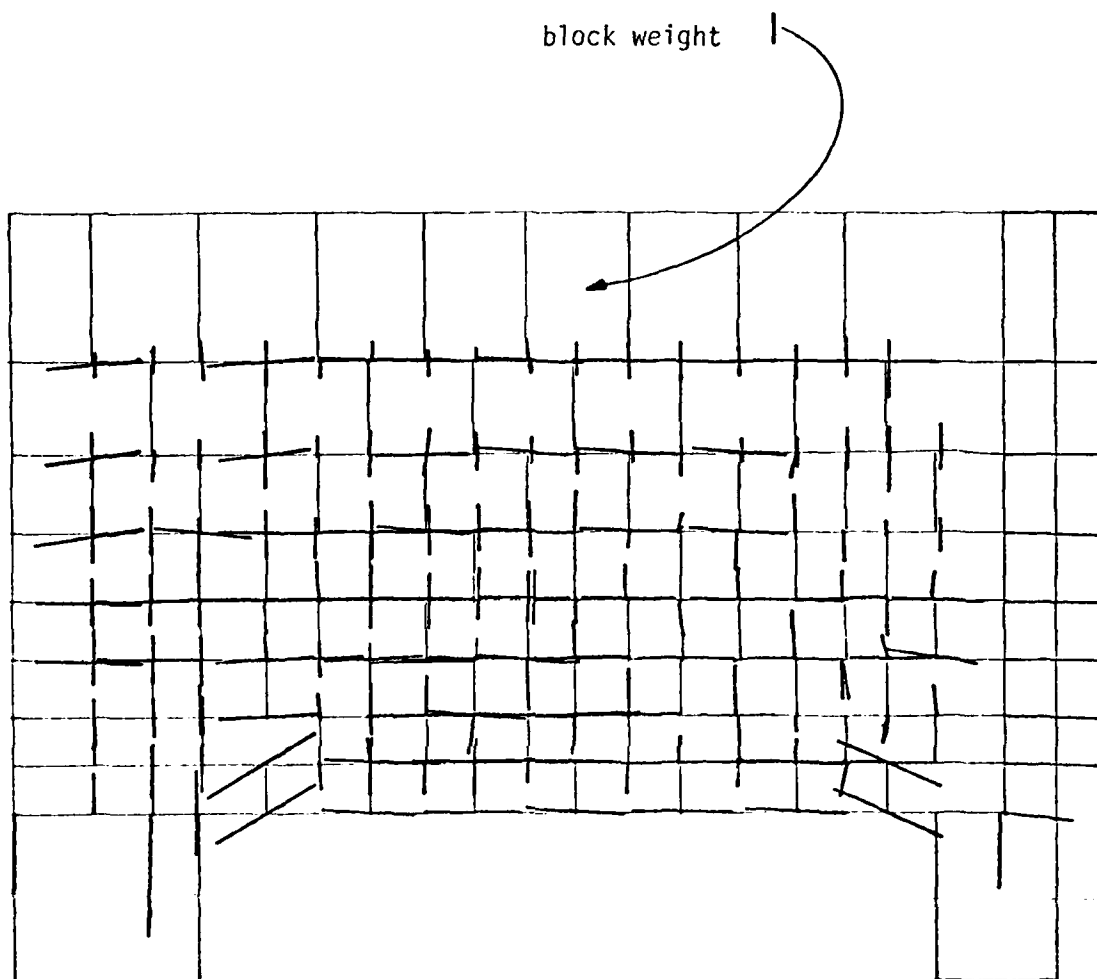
Roof and ground arch development inhibited due to high horizontal forces.
